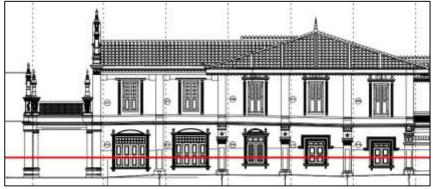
Datum line to show settlement on the left elevation of *Bilik Beristirehat*.
